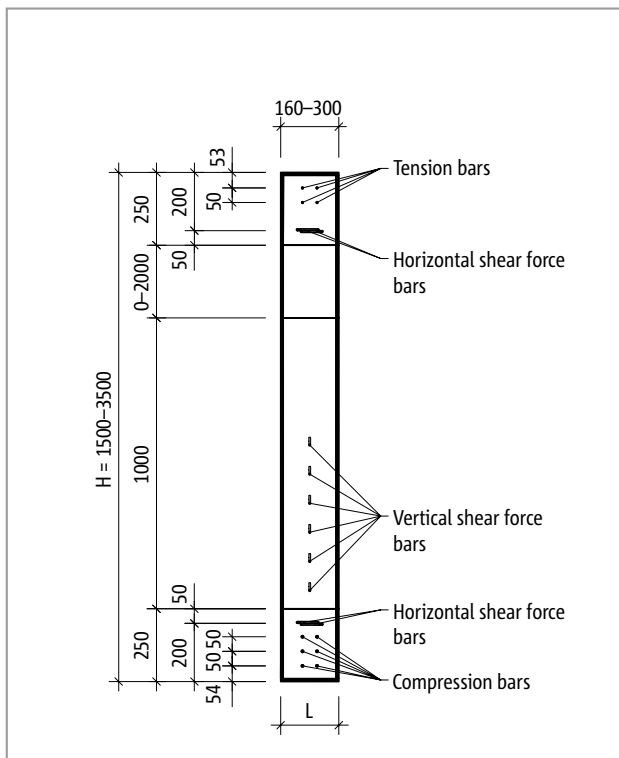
Schöck Isokorb® XT type W-M1-R90: Product layout; perimeter fire protection boards
